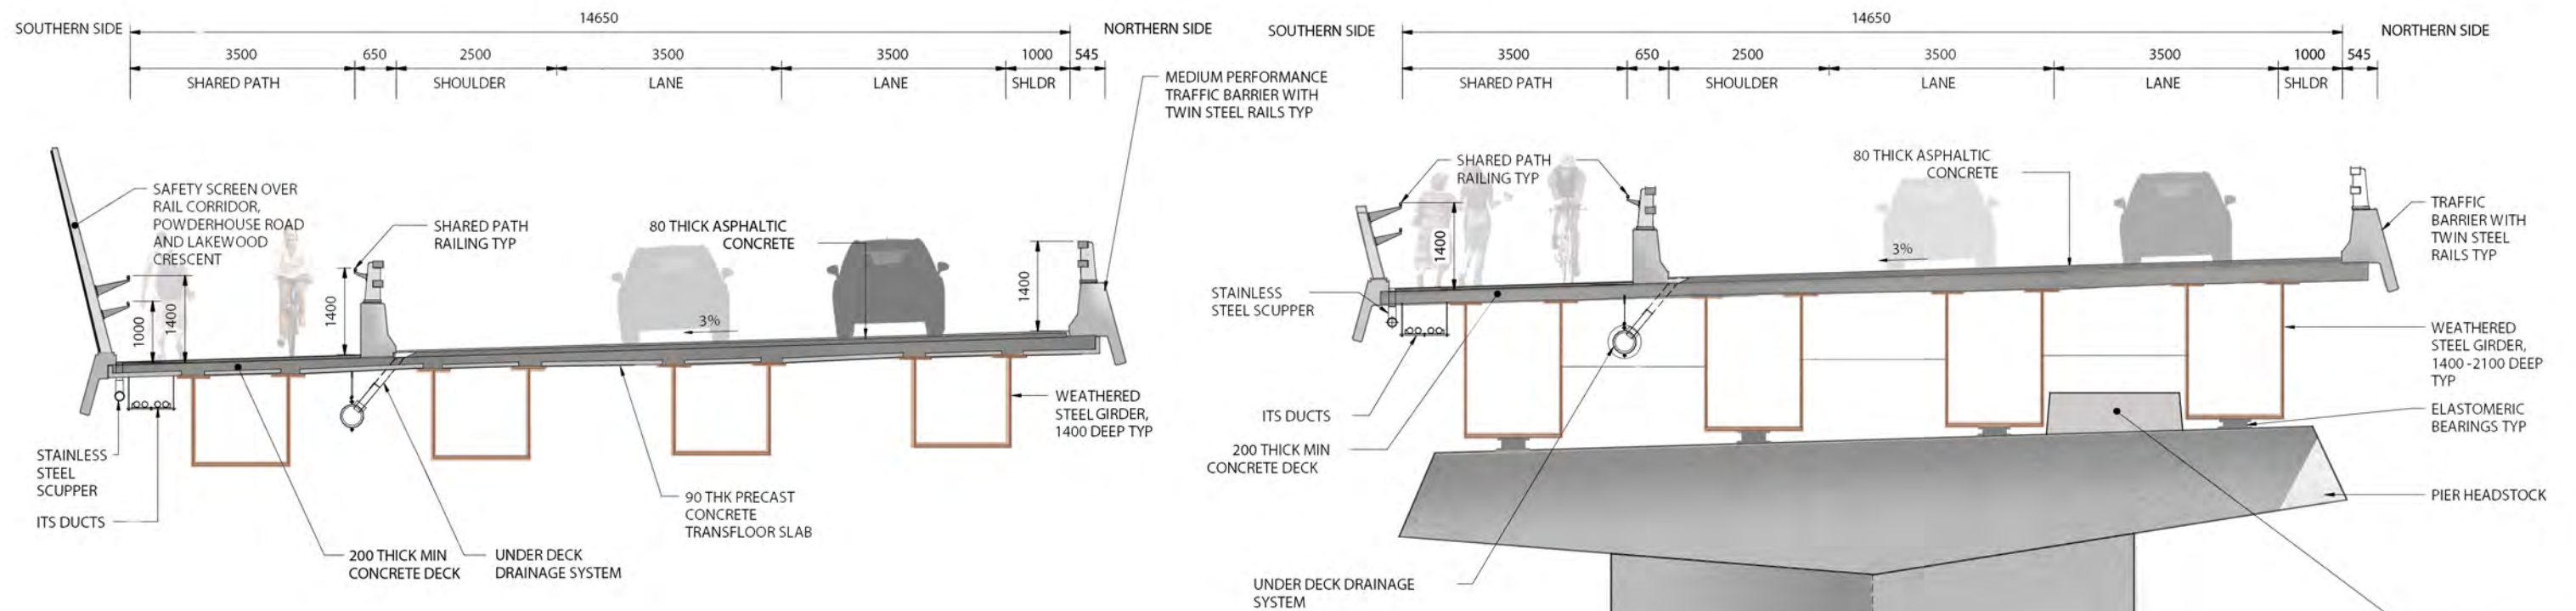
Typical cross section at the main river span. Scale 1:100
